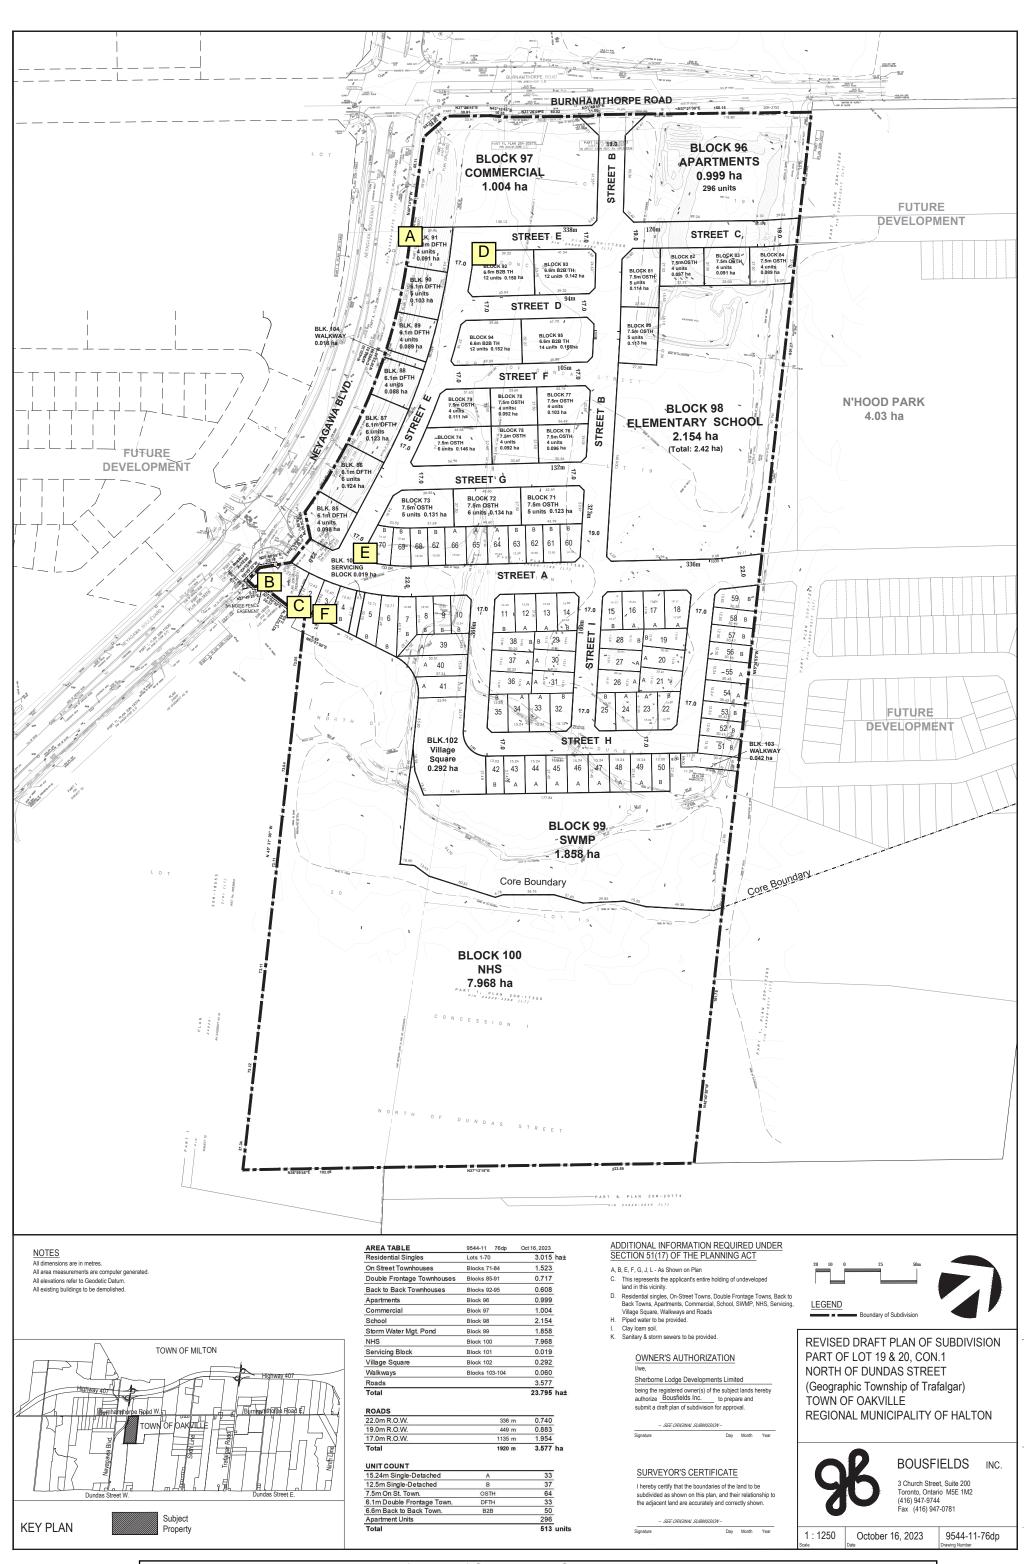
Draft Plan of Subdivision Showing Prediction Locations
